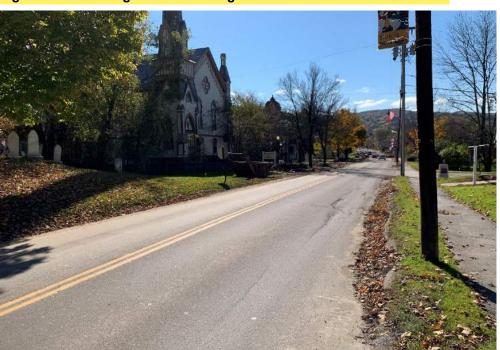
Bridge Street Existing Conditions - No-Action Alternative
